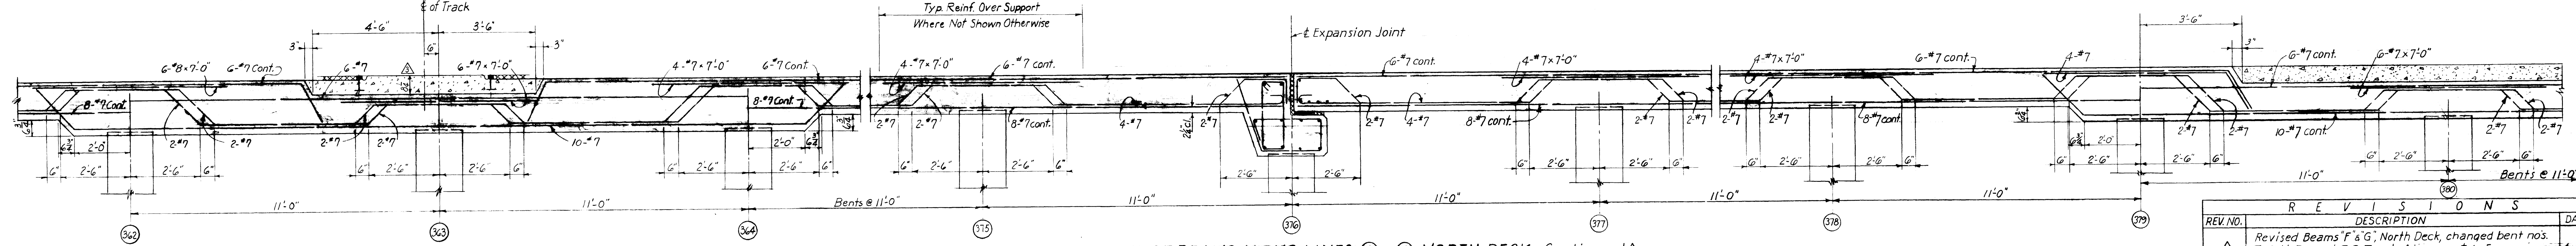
DETAIL OF BEAMS ALONG LINES F & G EAST DECK
